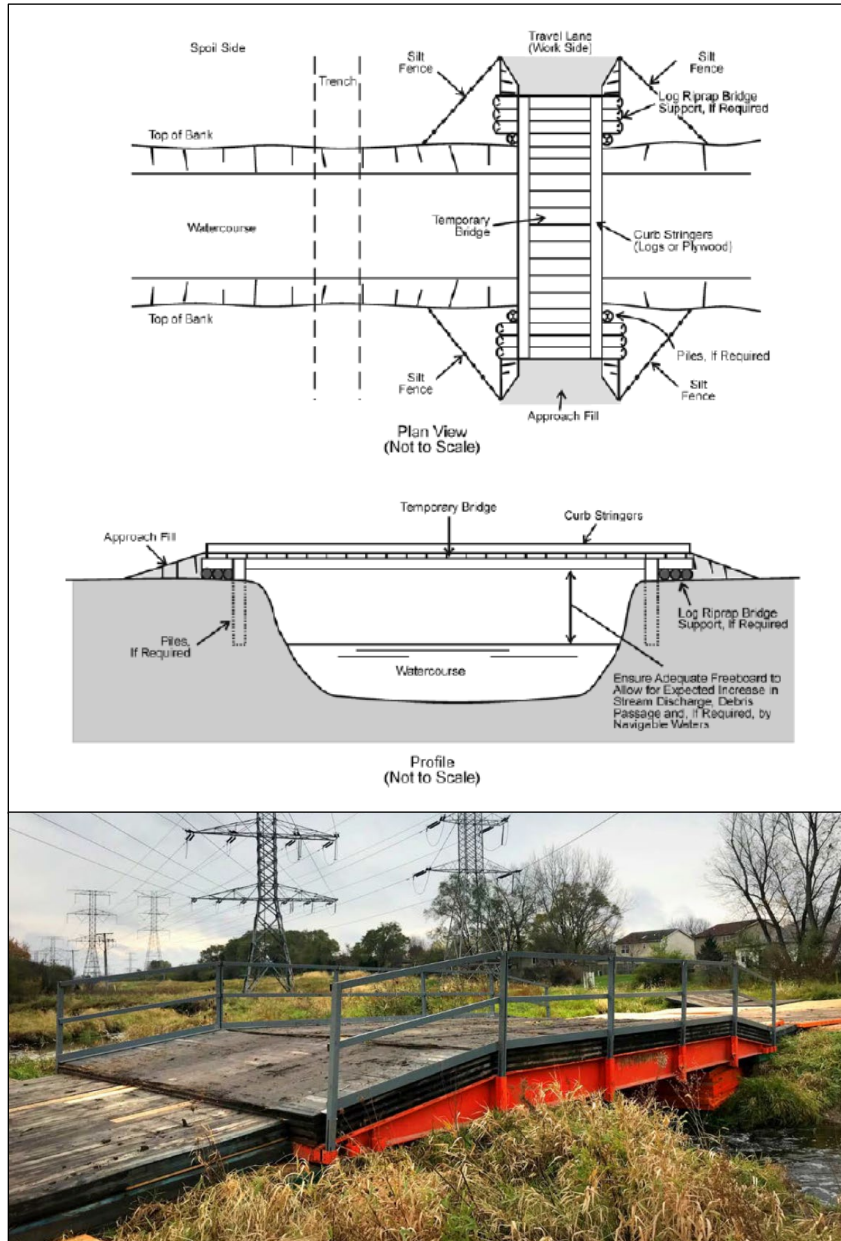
Typical temporary clear span bridge design (top) and Type B bridge (bottom)
